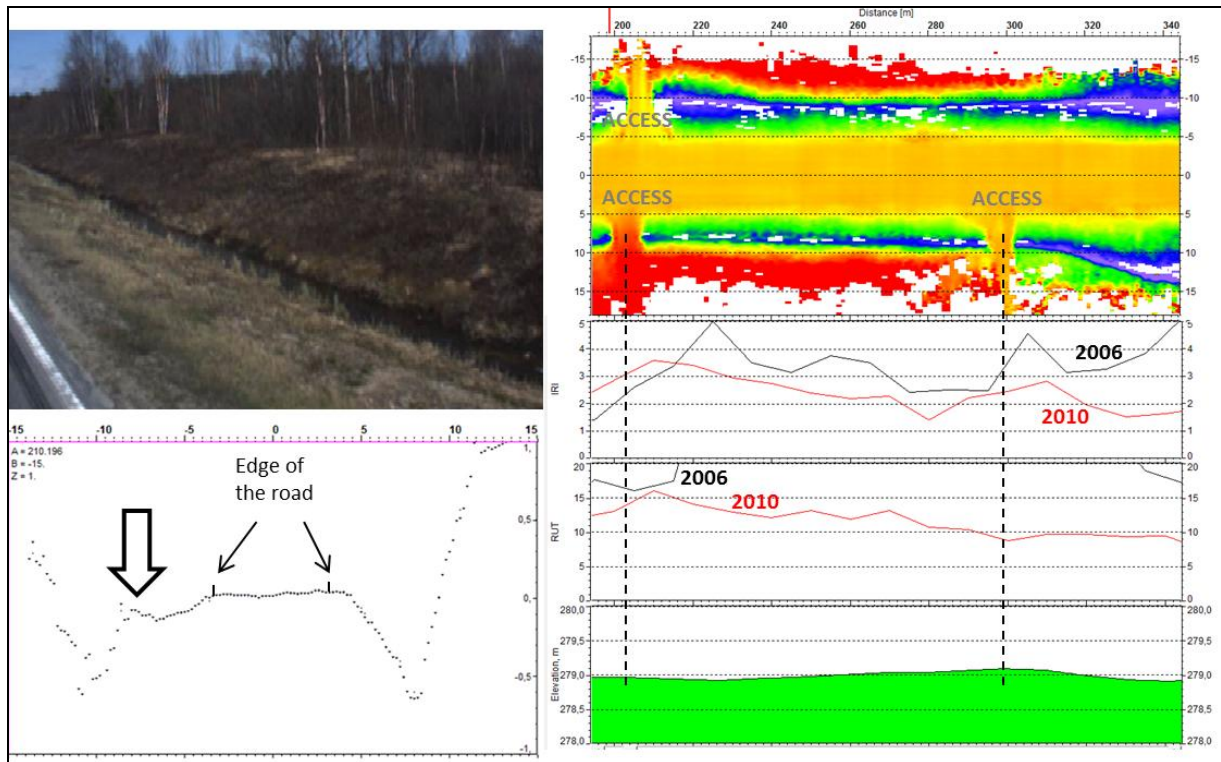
\_5. Example from drainage problems on highway 21, section 205. The water in the ditch on the right has backed up between the private road accesses, as can be seen from the video picture taken from chainage 210 m. Most likely the private road access culverts are clogged. The elevation frame (fourth on the right) also shows that the road elevation shelves gently down to the private road access at chainage 200m. Rutting values (third frame on the right) were higher than 20 mm in 2006 but had decreased by 2010. This is due to the road being repaved between surveys, but the highest value still reaches 16 mm. The cross section (lower left, chainage 210 m) shows that the depth of the right ditch is only about 60 cm. Excavated materials from cleaning out the left ditch bottom have been deposited on the inner slope of the ditch (arrow) and this slope is now slipping and filling the ditch.
